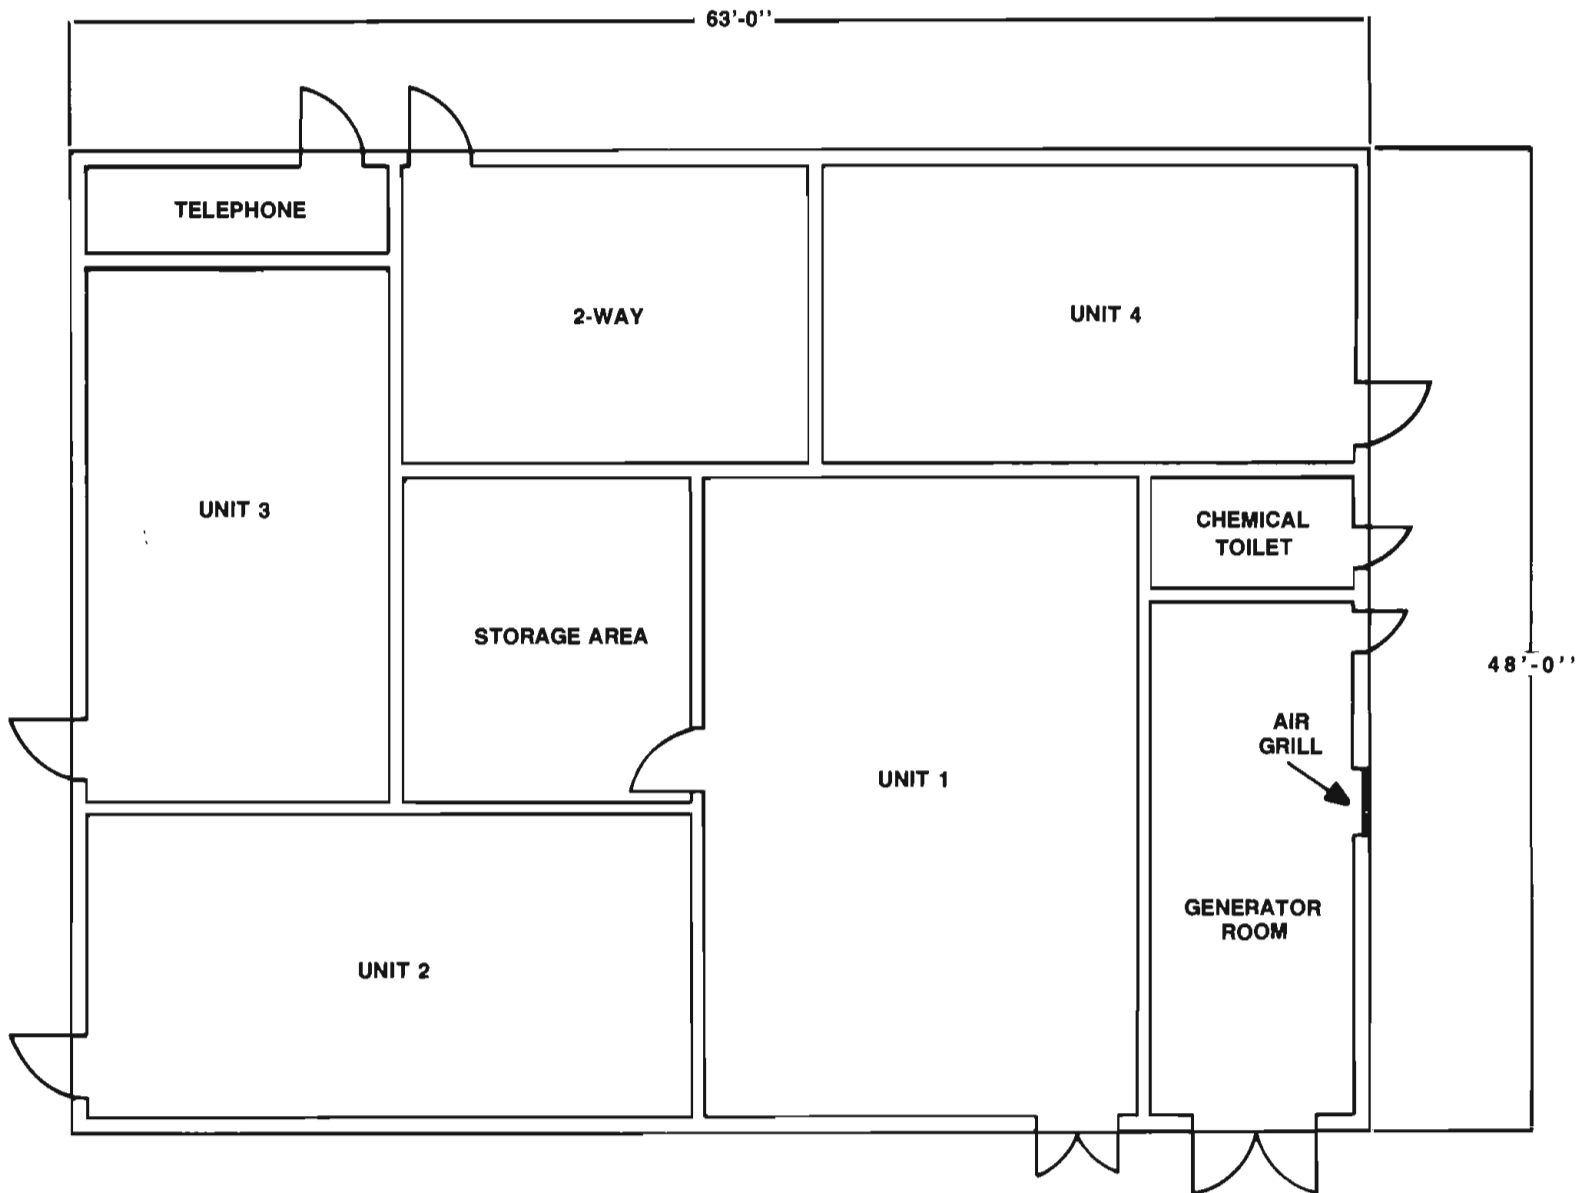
Floor plan for the KLSI-FM transmitter facility. Four individual rooms are provided for FM transmitters, plus an enclosed generator room and 2-way radio equipment room. The building is constructed of precast concrete "double-T" sections.
